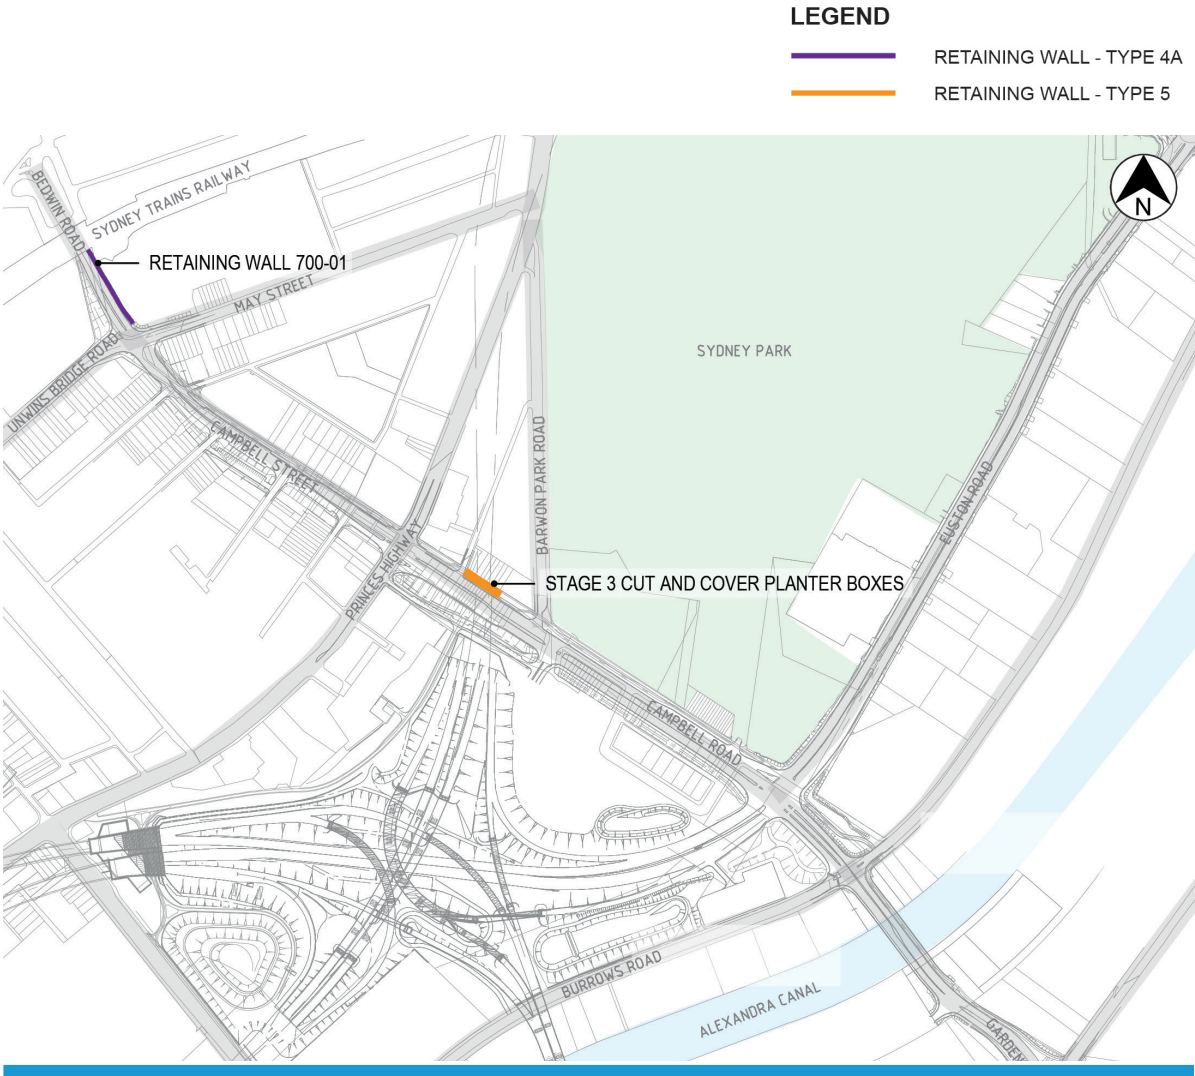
Campbell Street Green Link- Retaining Walls - Key plan
